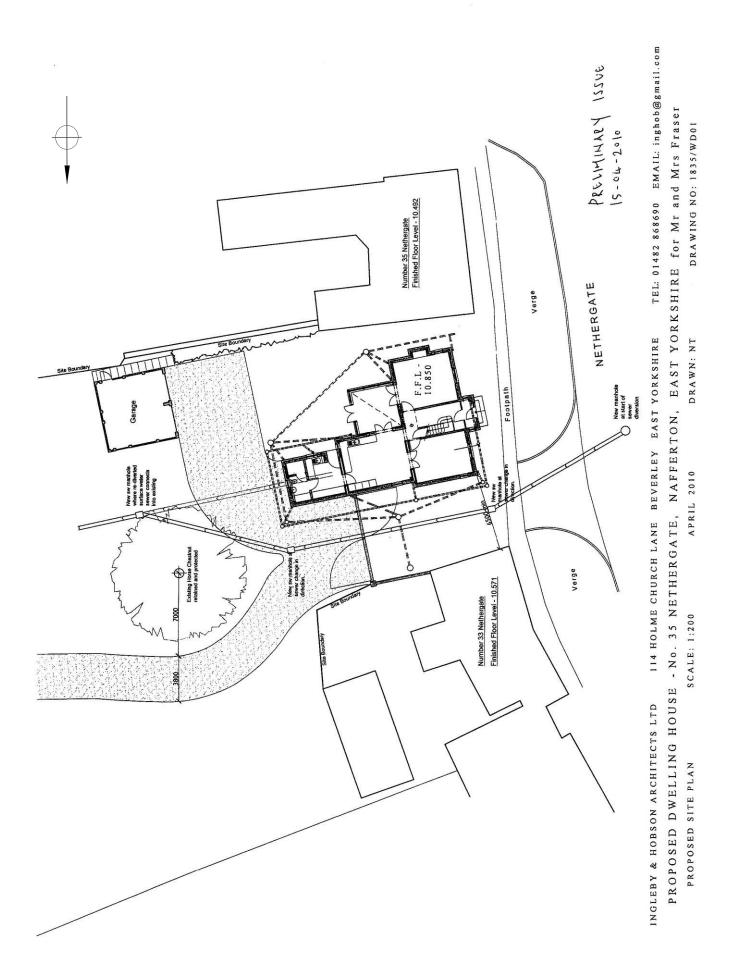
SITE LAYOUT (not to scale - plan supplied by Ingleby & Hobson)
